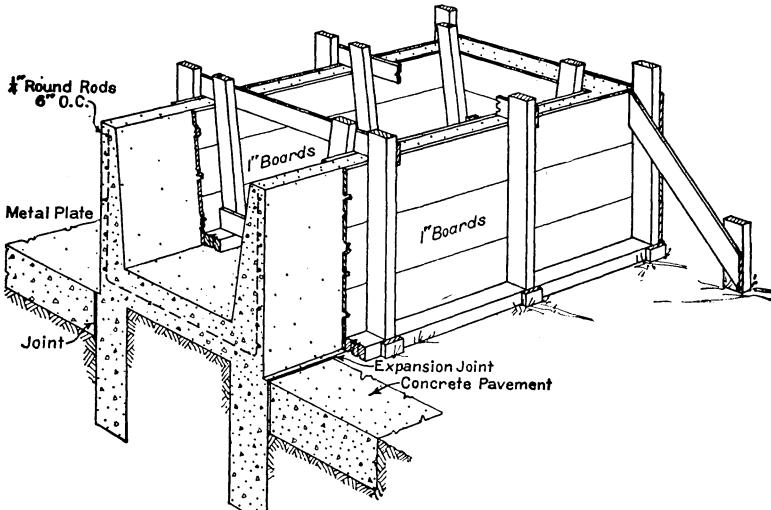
Method of constructing rectangular trough directly on the ground. The pavement is laid after the trough is completed
